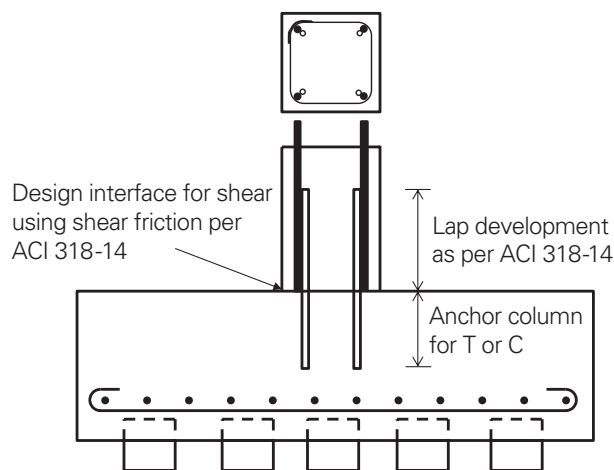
Typical reinforced concrete column-to-pile cap connection detail.
